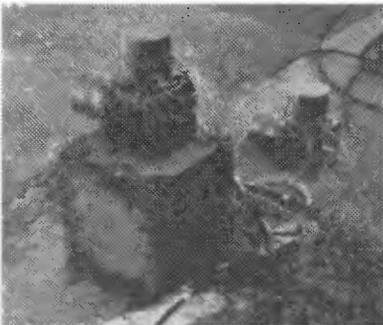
The accelerometers of the central caissons were fixed on a concrete cube
